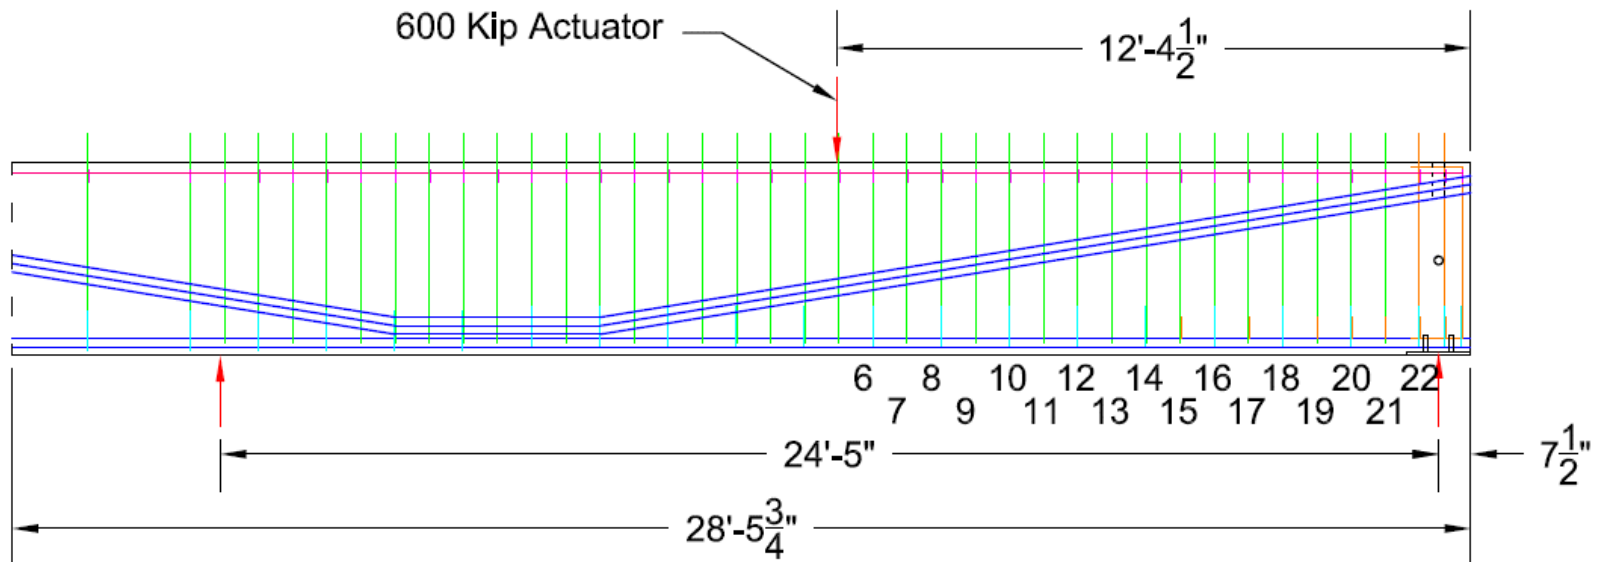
Elevation view of 45M_8W girder including load point location and nominal span length.
